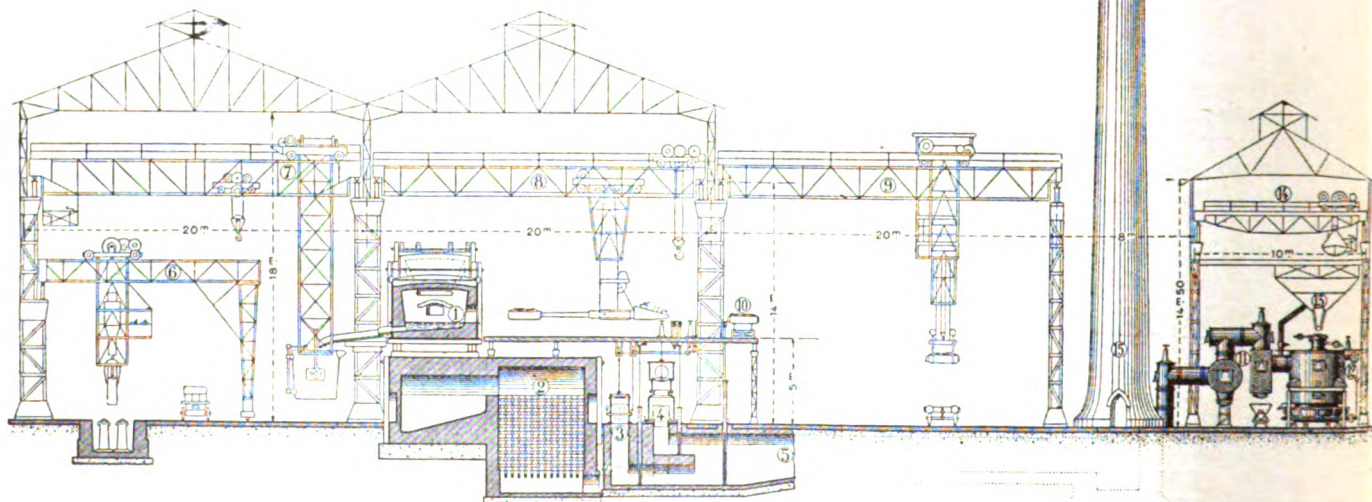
An open hearth steelworks with 50-ton gas-fired furnaces (in France). Legend: 1, 50-ton furnace; 2, regenerators; 3, air-reversing valve; 4, Forter gas valve; 5, chimney flue; 6, 8-ton overhead traveling stripping crane; 7, 80-ton casting crane; 8, 4-ton charging machine; 9, 10-ton overhead traveling box-lifting crane; 10, stack of charging boxes; 11, gas mains; 12, gas producers with reversing grates; 13, coal hoppers; 14, 4-ton overhead traveling grab bucket crane; 15, stack.
